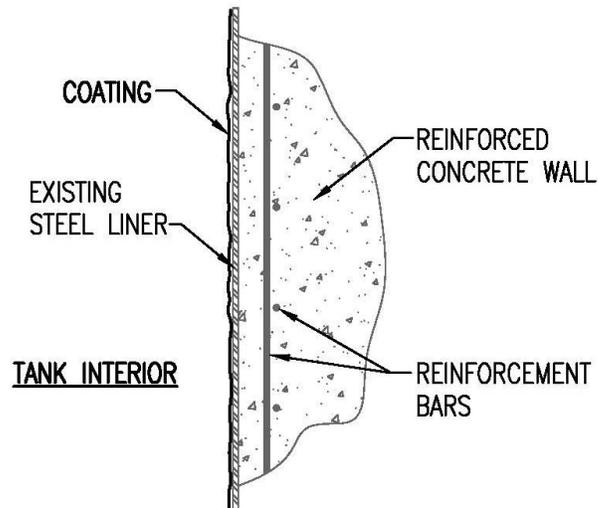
Tank Upgrade Alternative 1B - Typical Wall Section
